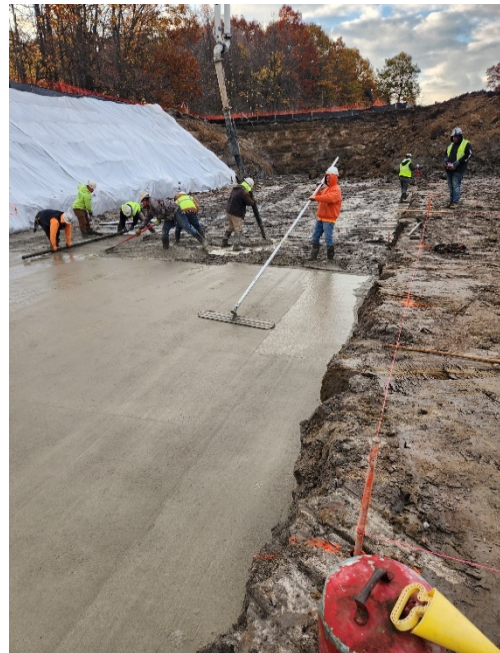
Protection of slope and perimeter drain placement during EQ basin excavation.
